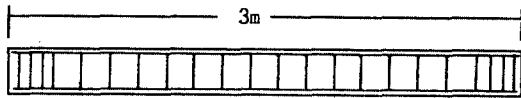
Distribution of Longitudinal and Confinement Reinforcement
